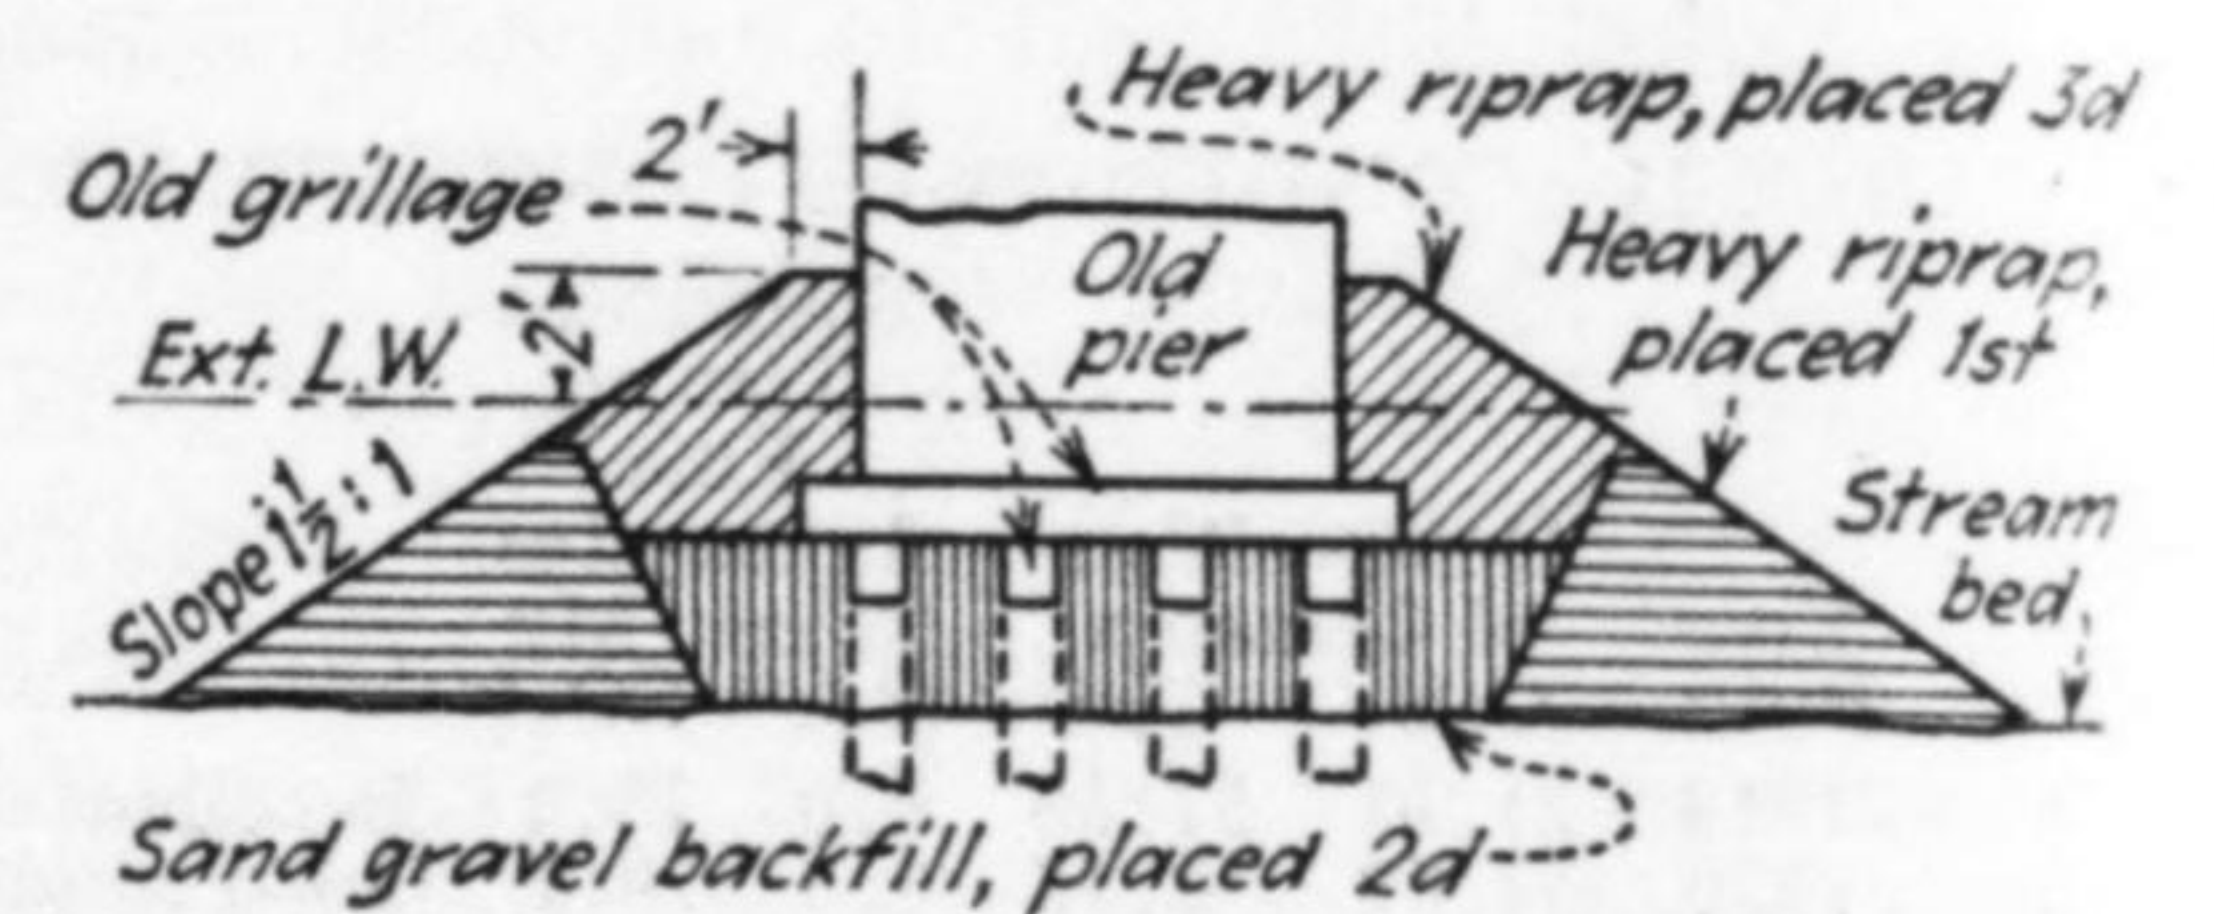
Backfill around old brick piers strengthened and protected sufficiently so that they could be used for the new structure.
